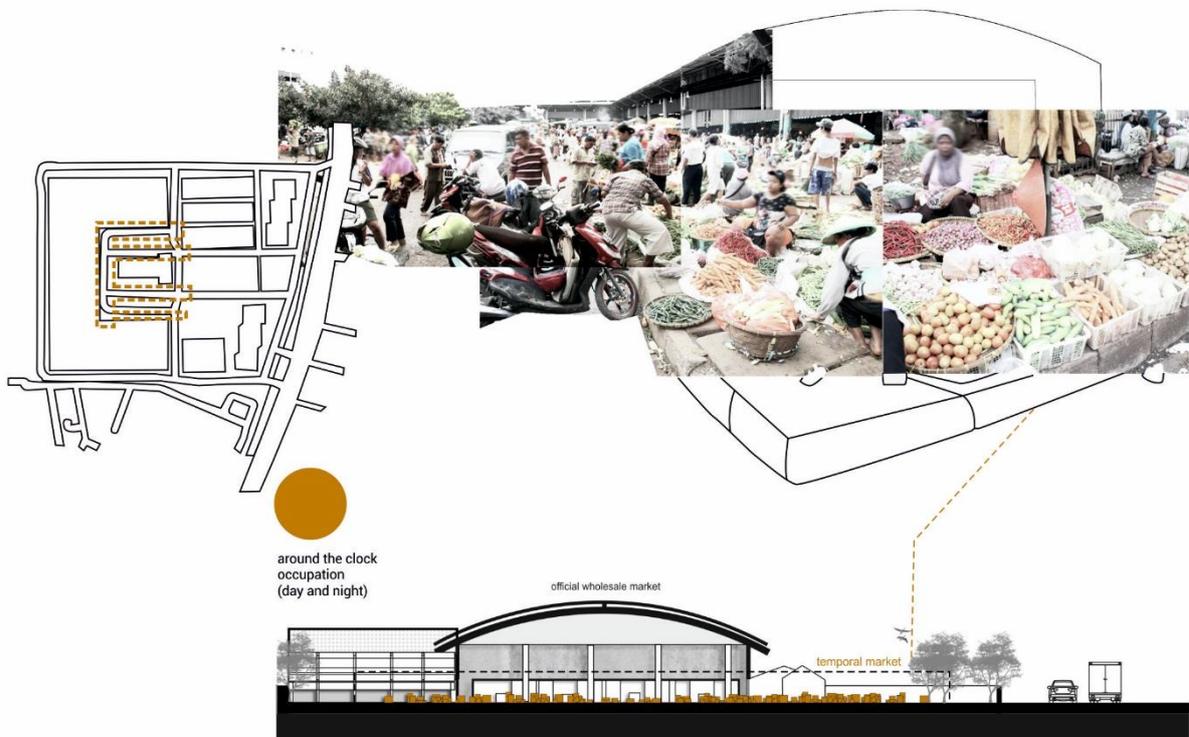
Site plan, collage and sections of street vendors around Kramat Jati wholesale market (Source: drawn by the author)
